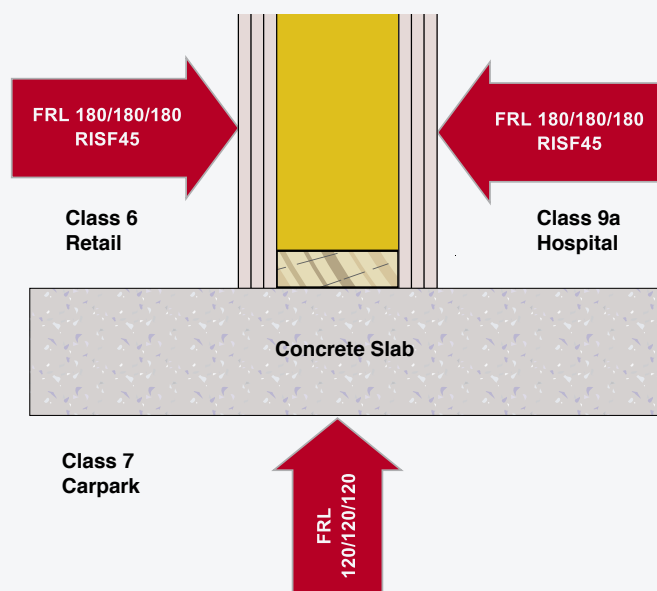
Typical timber frame detail for separation of different parts of the example building.
